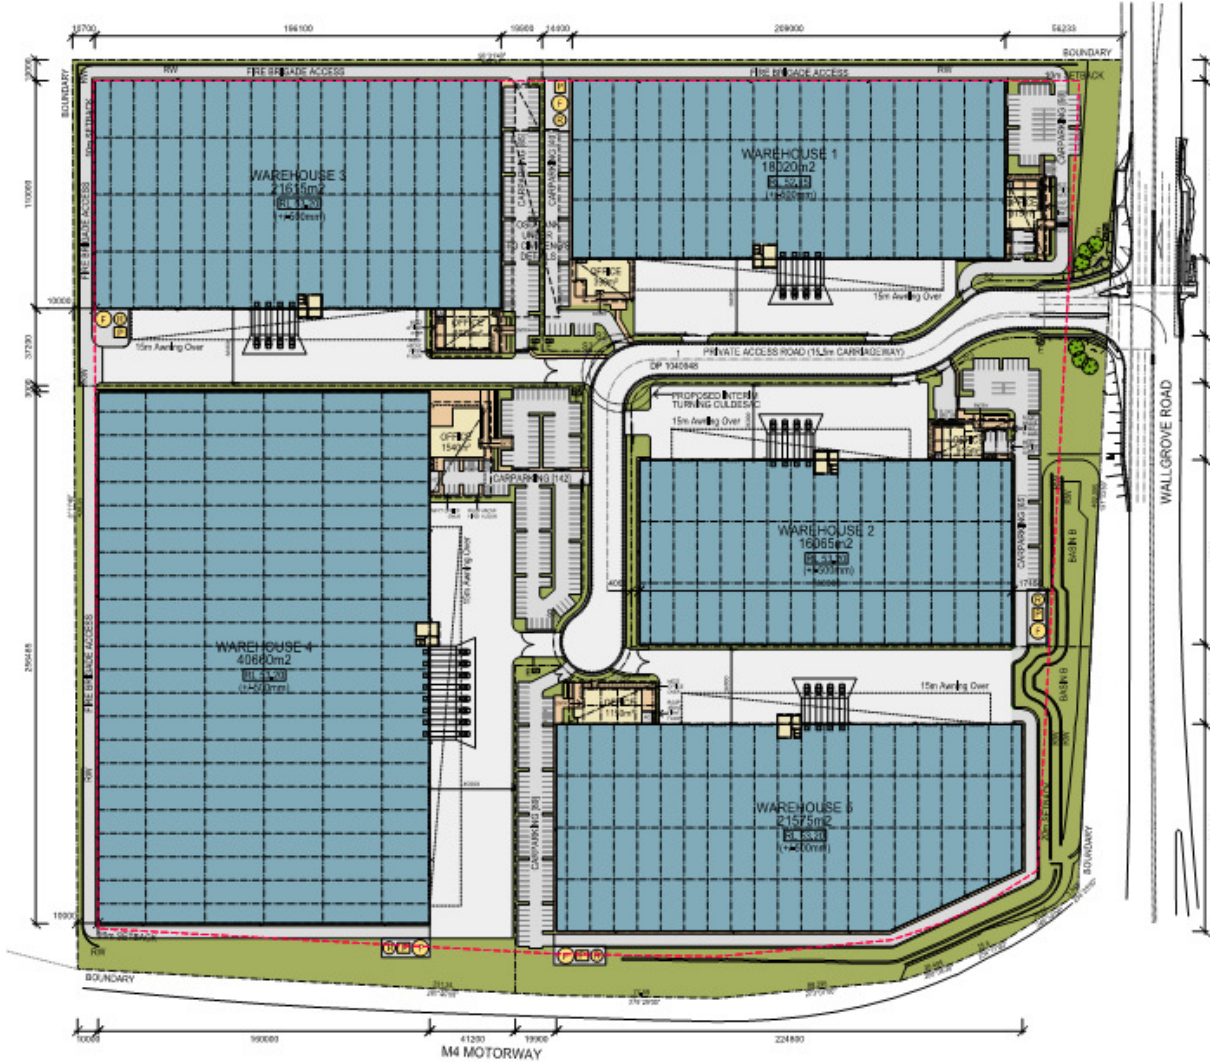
60 Wallgrove Road, Eastern Creek site plan
